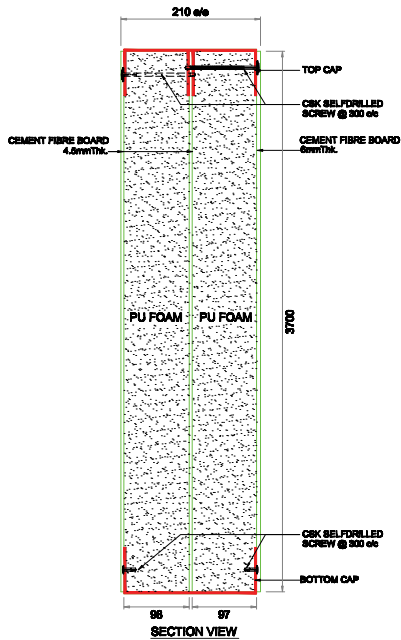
A: 210mm Panel Plan & Elevation Section View
